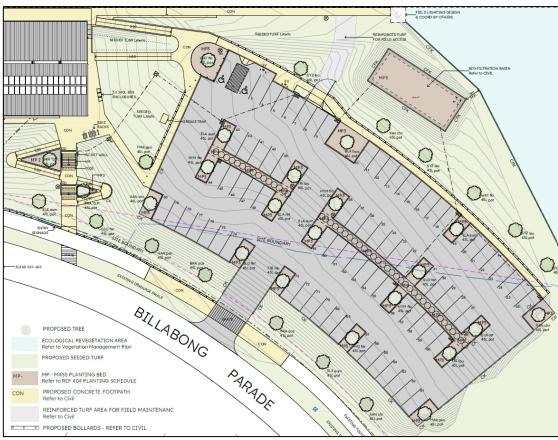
Site Plan east side Floorplan Extracted from Attachment 1 (Source: Council, 31/07/2025)
